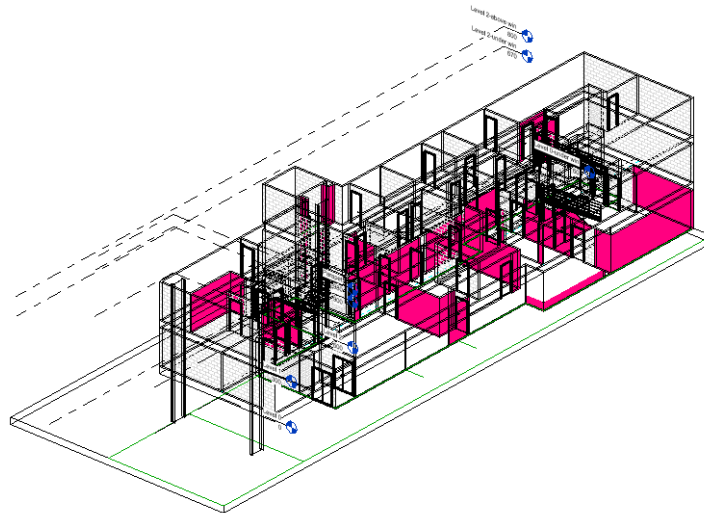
BIM model of LU building 1 showing in magenta the plasterboard located in walls.
